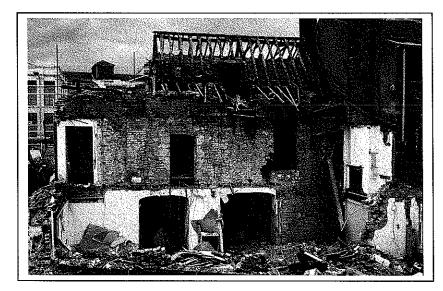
Early ironstone walls and timber roof incorporated in number 53 Bridge Street. Observed during demolition.
